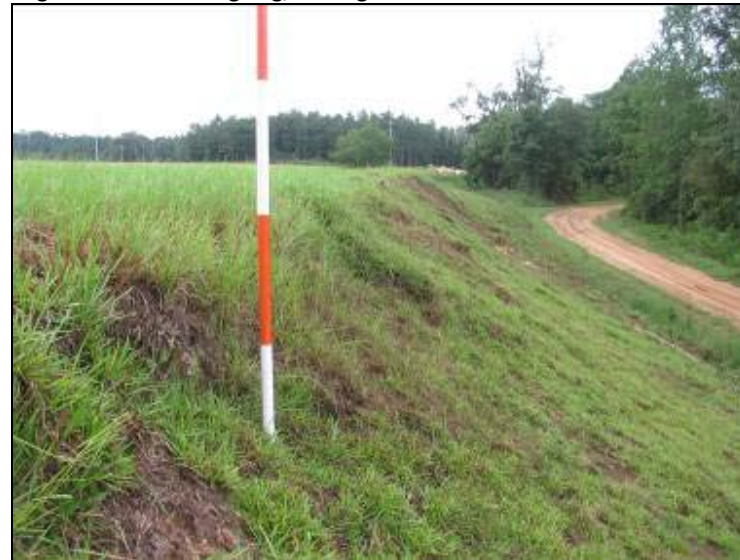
Ash Pond – West embankment exterior slope, scarp near crest of embankment, looking southeast.
